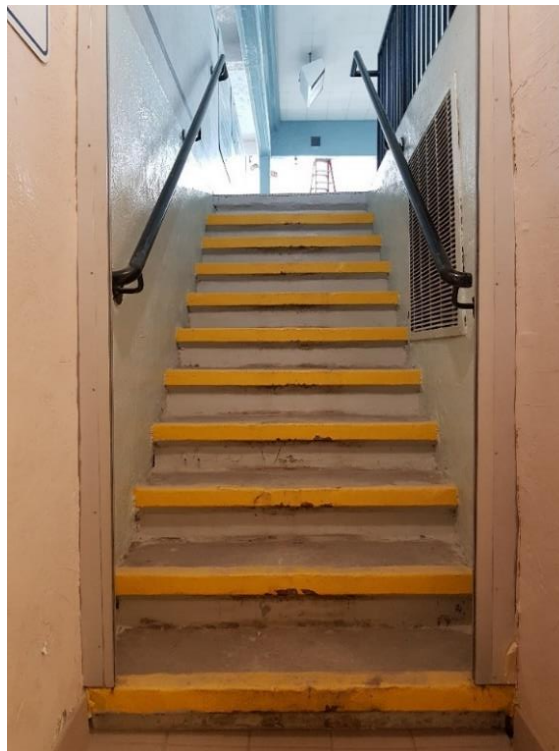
Stairs from the corridor north of the female change room to the pool floor.
